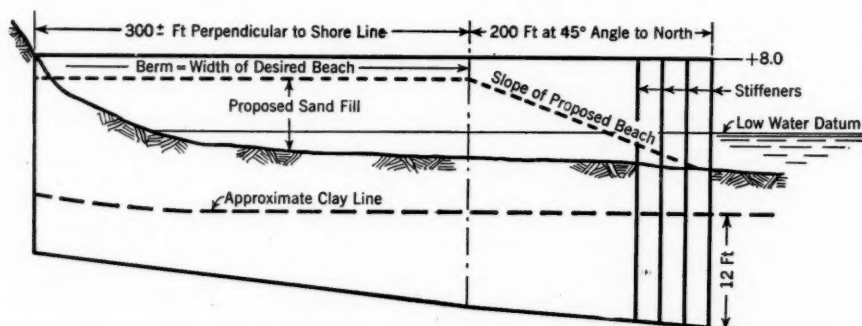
STEEL JETTY, SOUTHERN LAKE PLAIN SECTION
